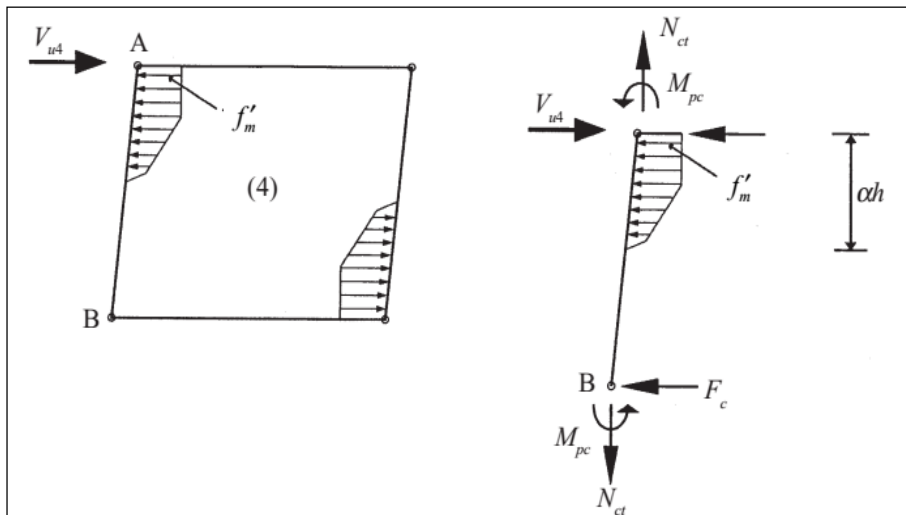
Failure mechanism 4 (Mehrabi & Shing, Seismic Analysis of Masonry-Infilled Reinforced Concrete Frames, 2003)
